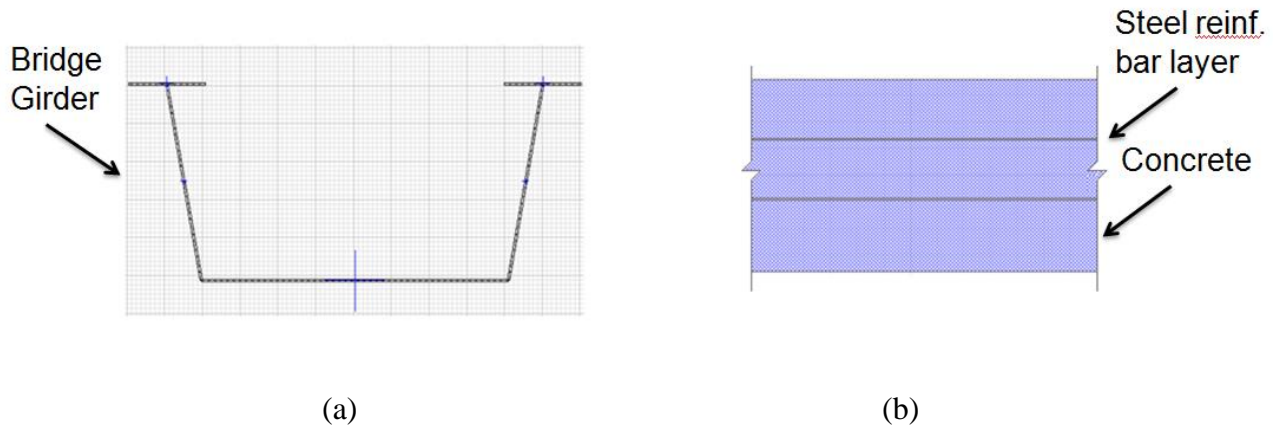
SAP2000 (a) girder cross-section and (b) link slab cross-section
